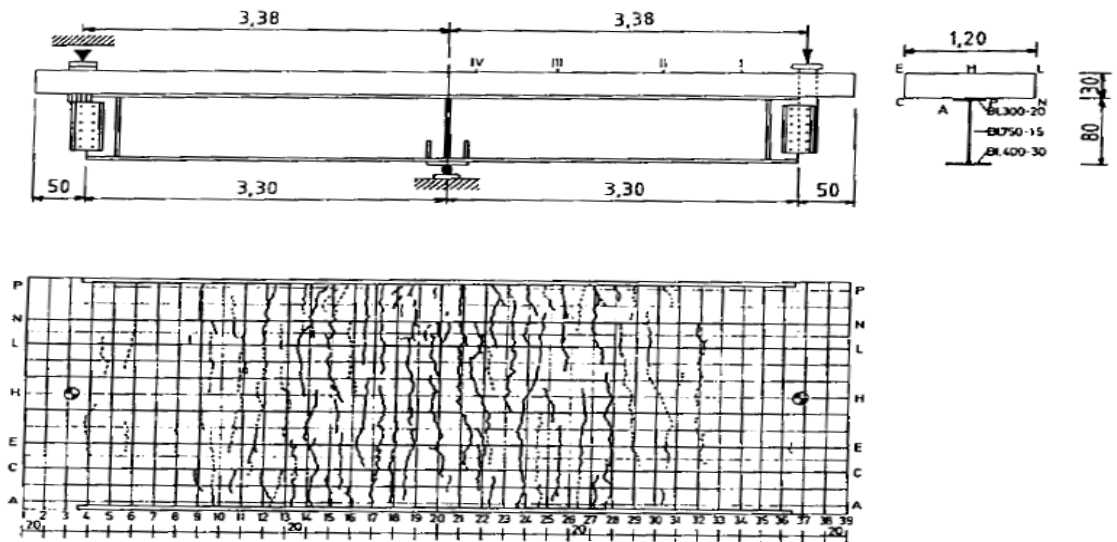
Test Set-up and Slab Cracking in Double Composite Girder Test. [3]
